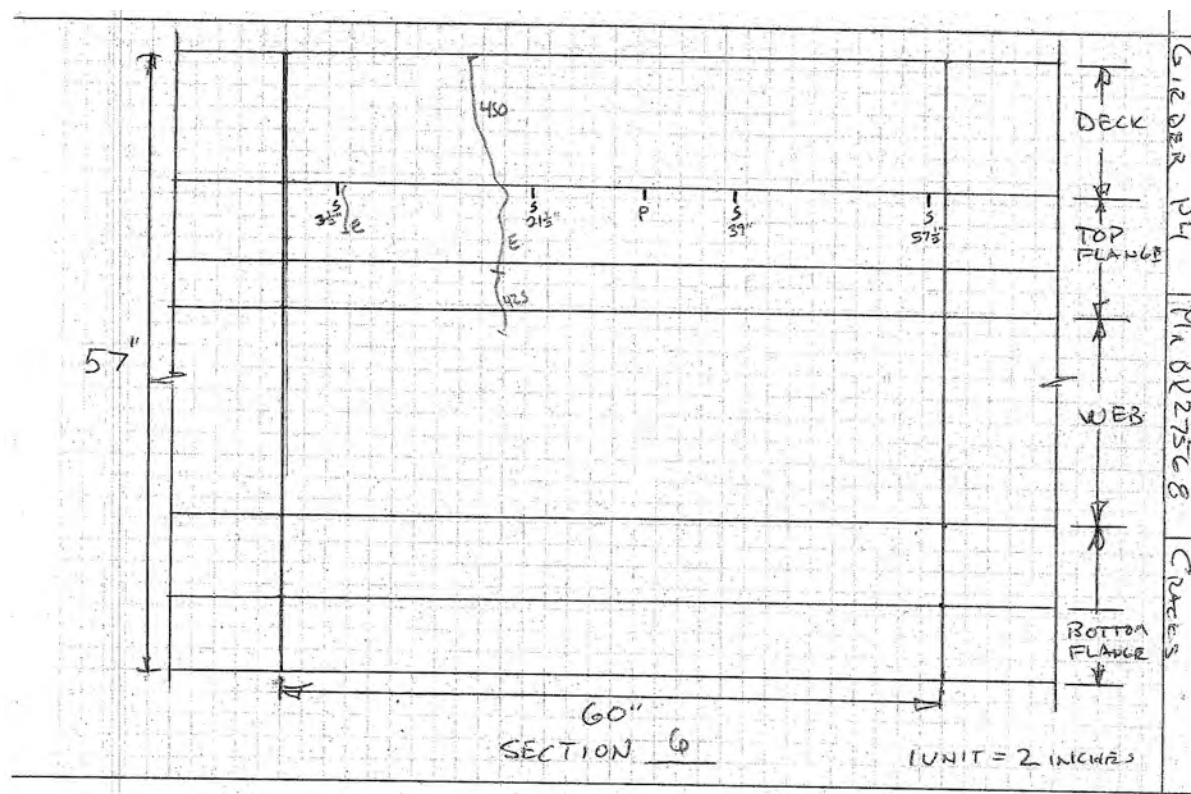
Girder P4 crack pattern – Section 6
